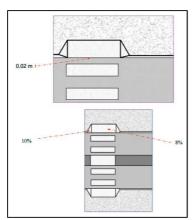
Relationship between the sidewalk pavement level and the road pavement level
